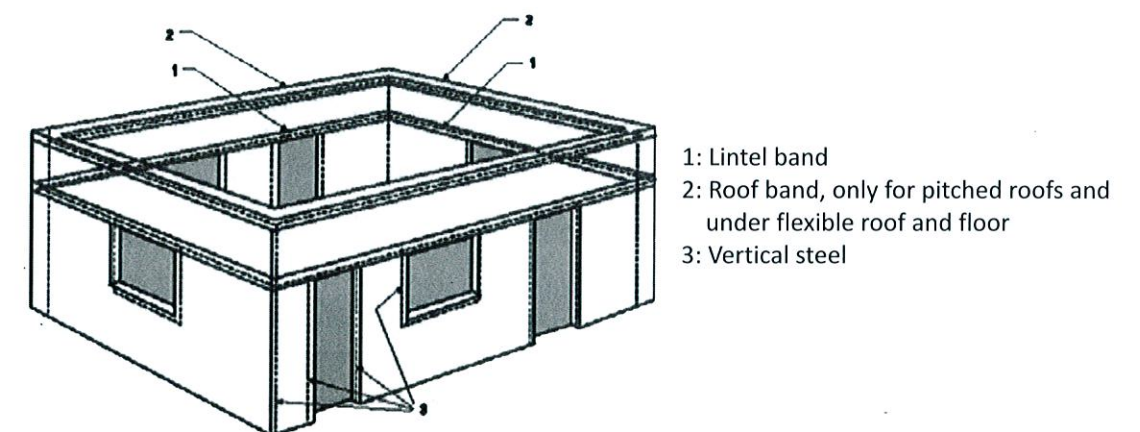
Overall arrangement of reinforcing masonry buildings
